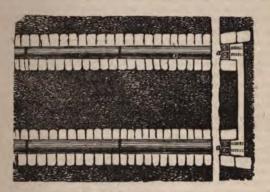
and 11 show in like manner, by a plan and section, the application of the invention to a street or road made of gravel, broken stone, or other road materials; but with the view of keeping the rail or plate as free from gravel as
